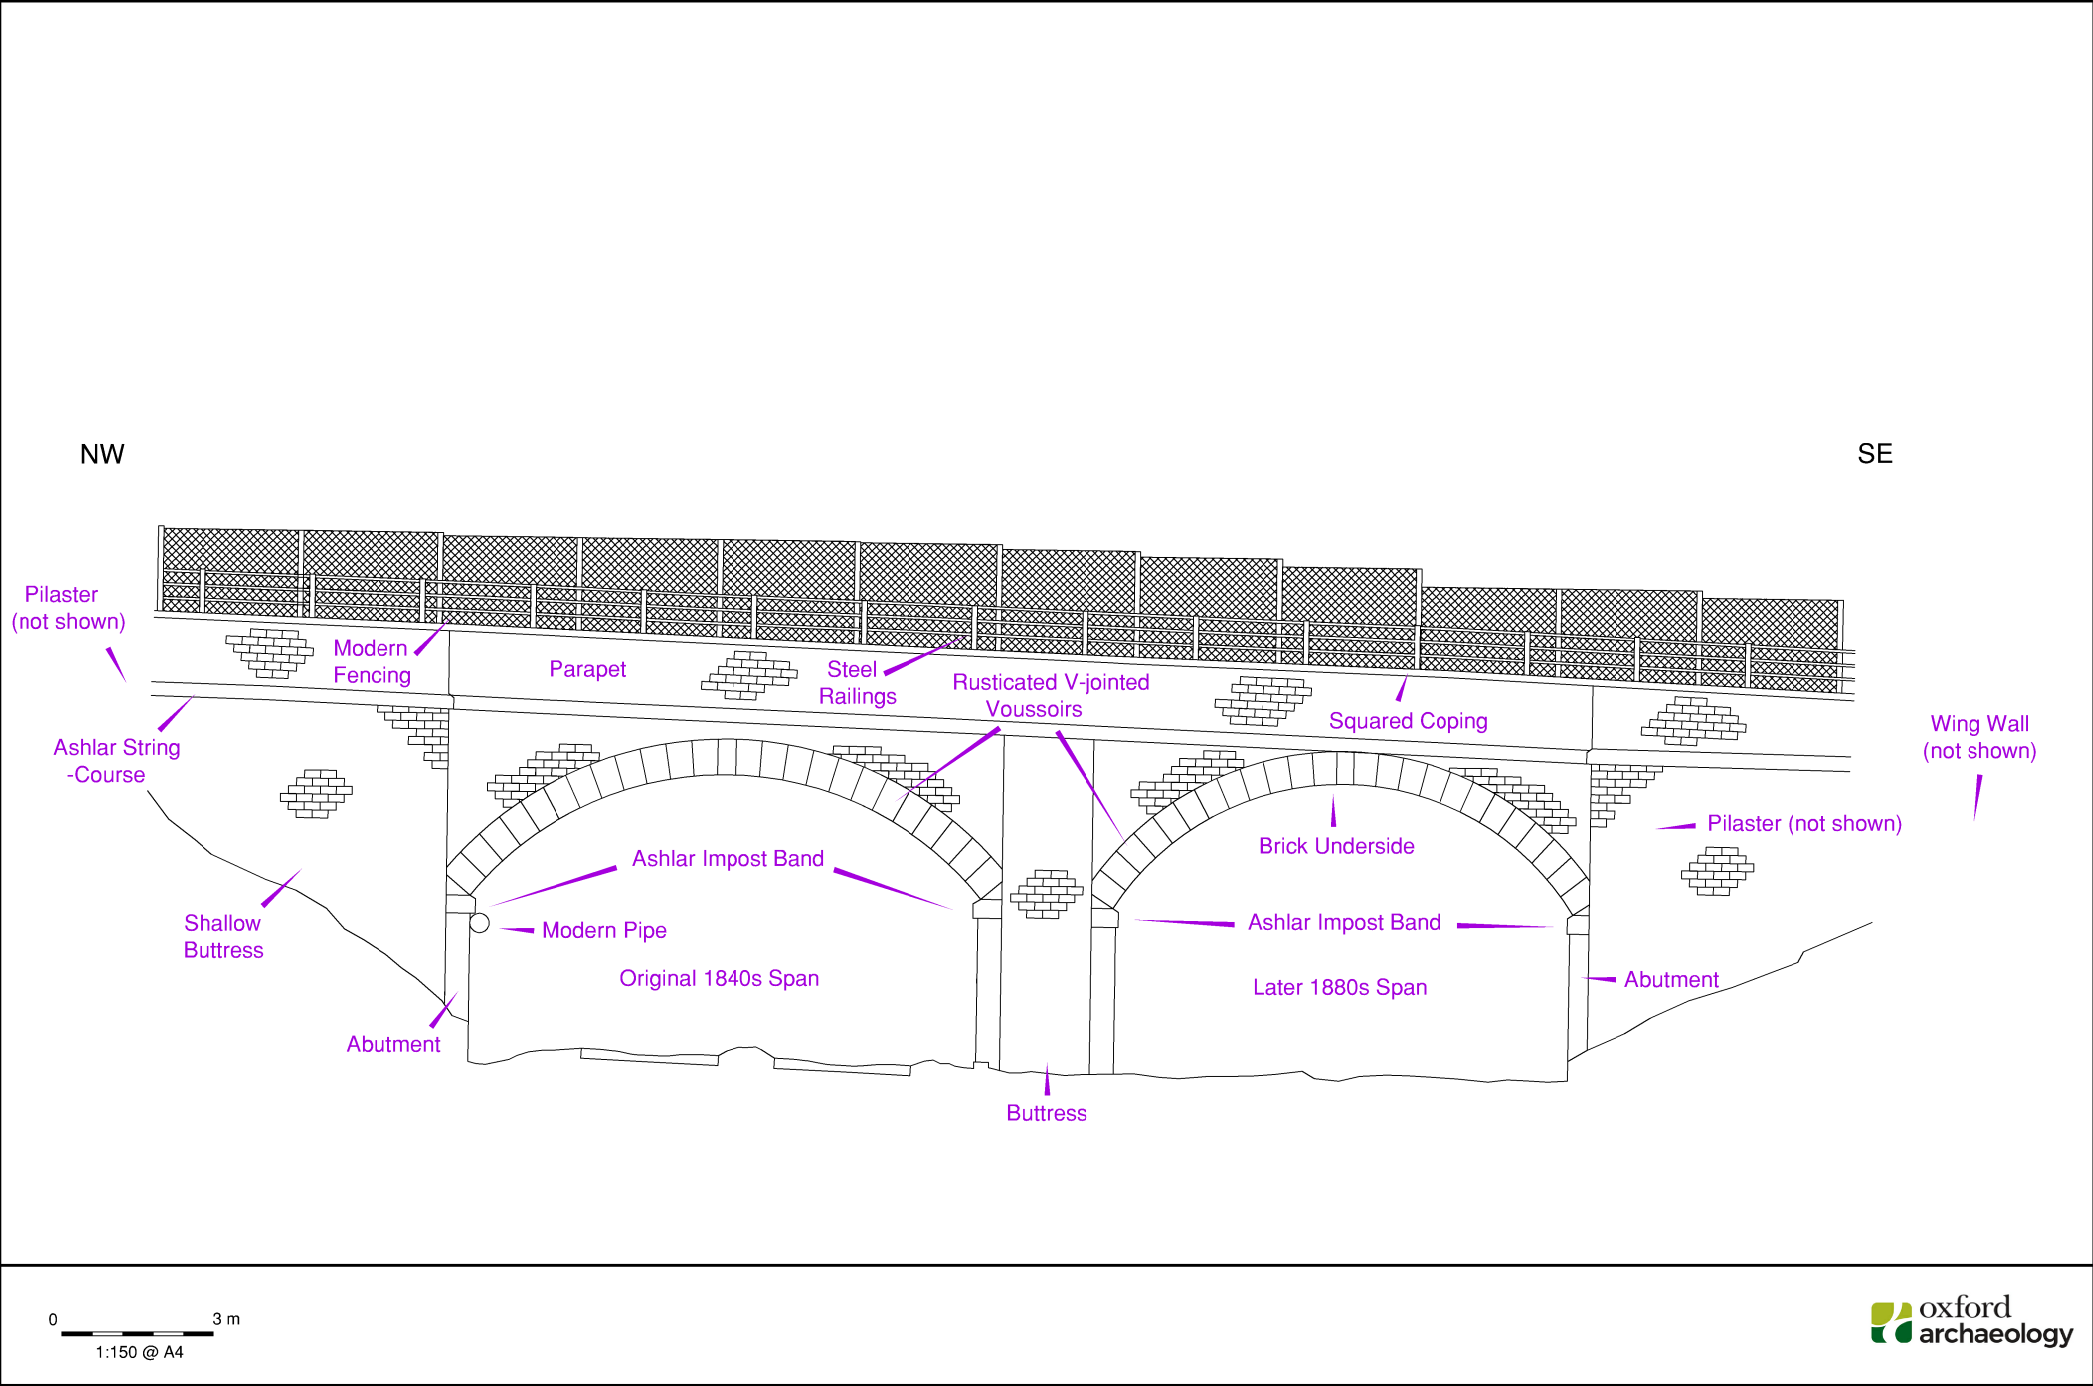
Wheatley's (Colliery Lane) Overbridge (MVL3/103) Annotated South-Western Elevation
